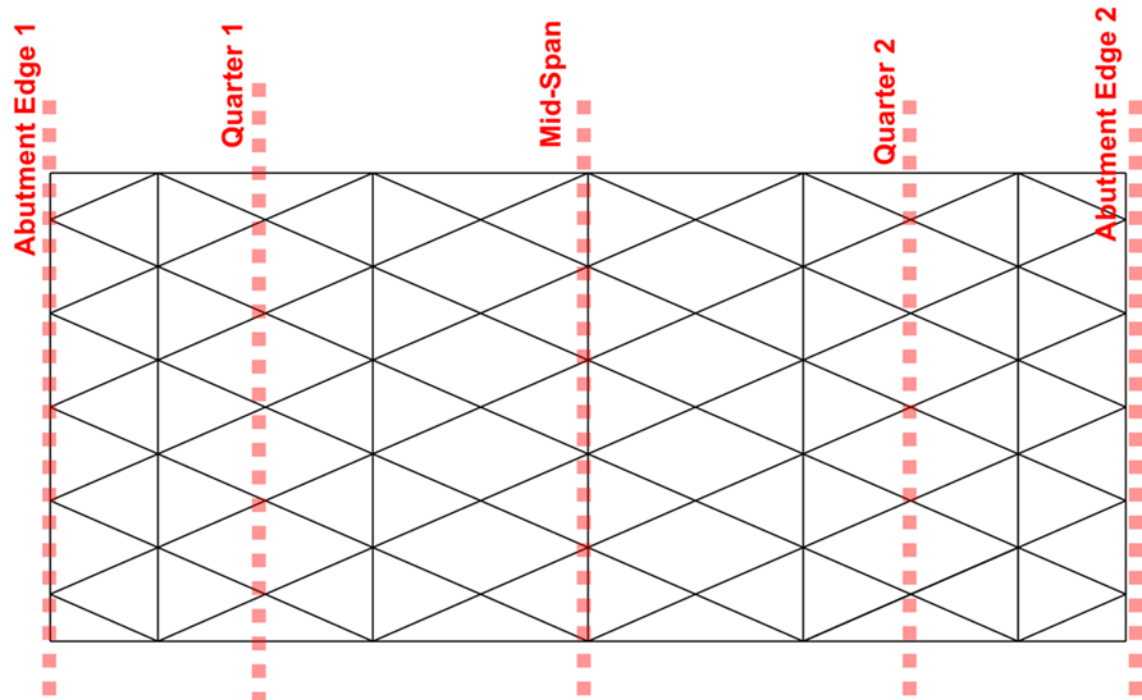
Shell 2 Key Plan (not to scale) rotated to correspond to schematic section below
